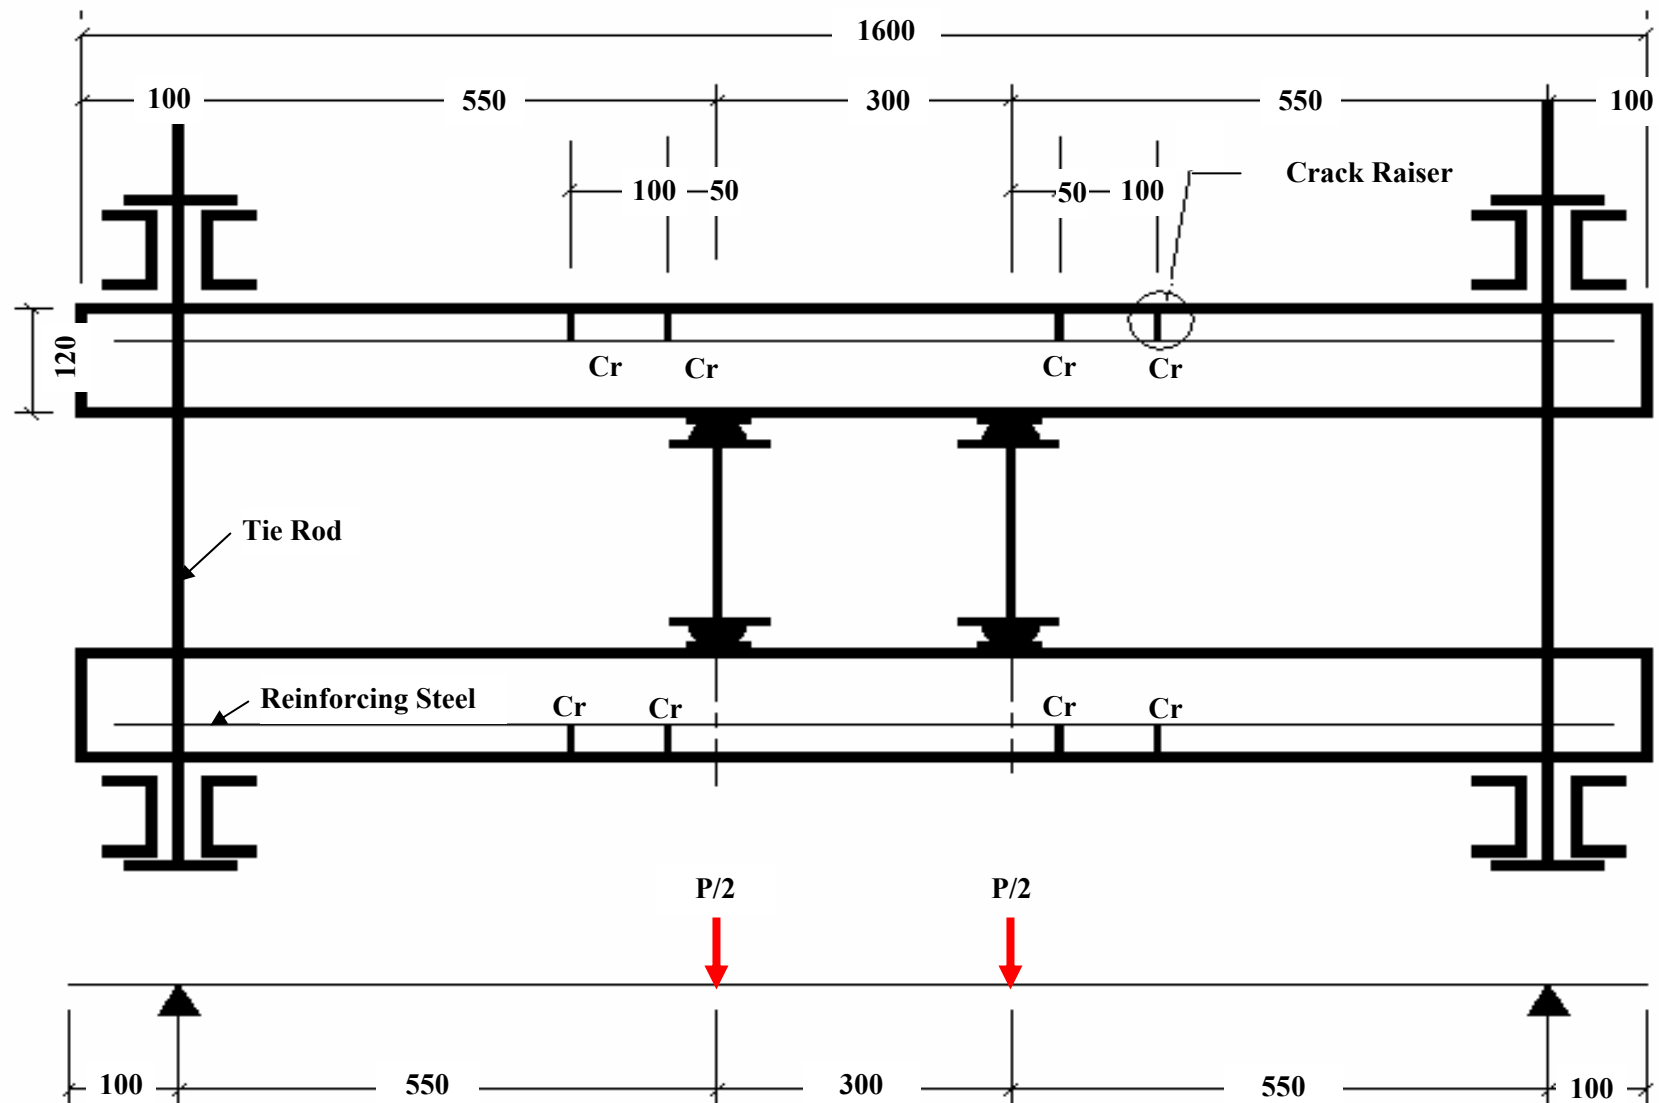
Four-point bending scheme test setup used for cracking slab specimens
